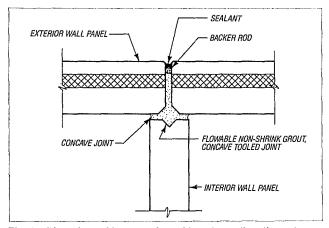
Plan view of intersection of interior cell walls and exterior non-loadbearing insulated panels.
